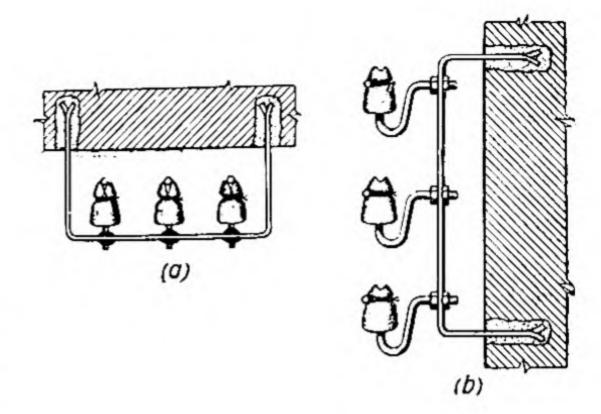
Stirrup-mounted sets of pin insulators cemented in place: "-fixed to celling; b-fixed to wall.
